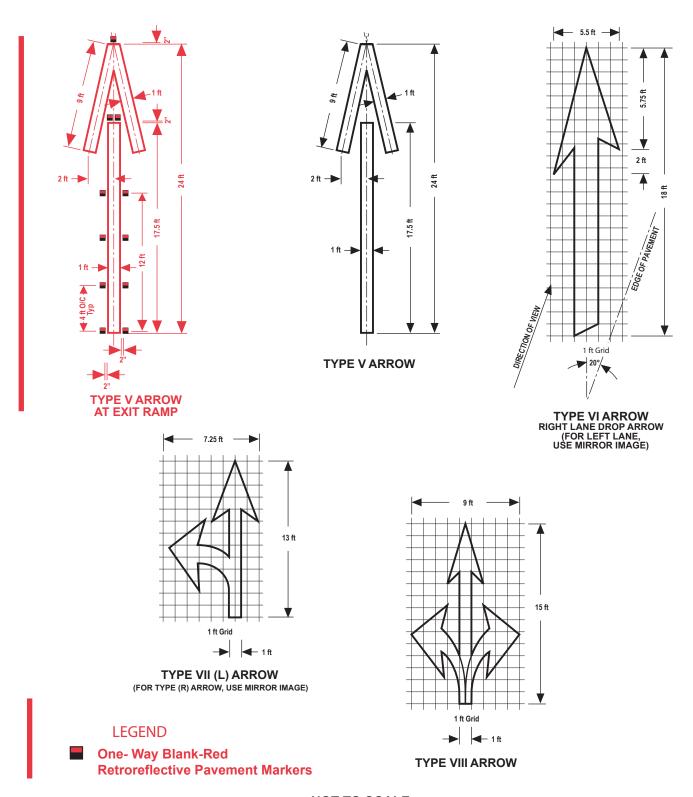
B-24 (CA). Examples of Standard Arrows for Pavement Markings (Sheet 2 of 8)
